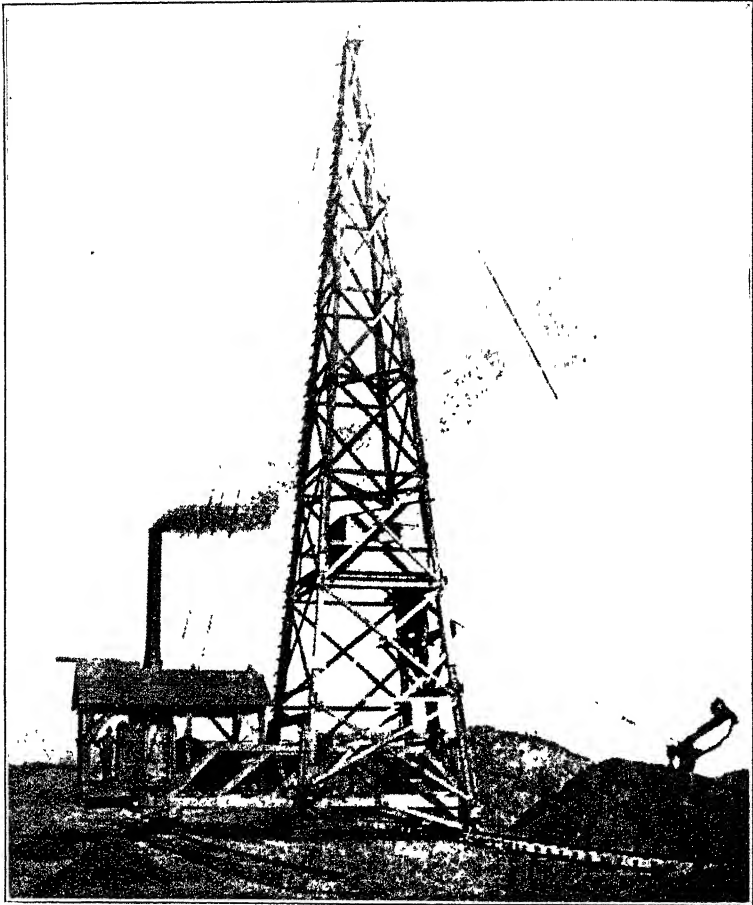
Tower Excavator Operating on New York State Barge Canal
